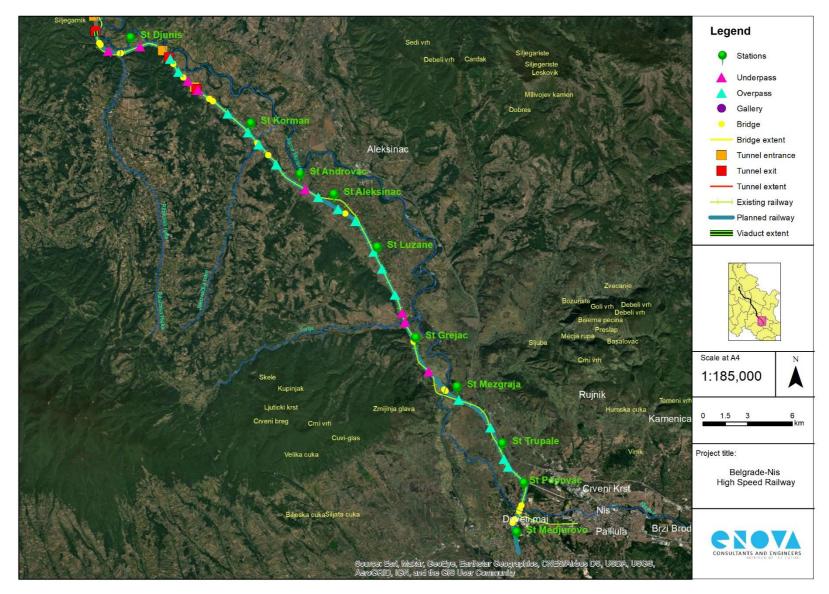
Existing and planned railway with ancillary structures (Djunis-Medjurovo subsection)
